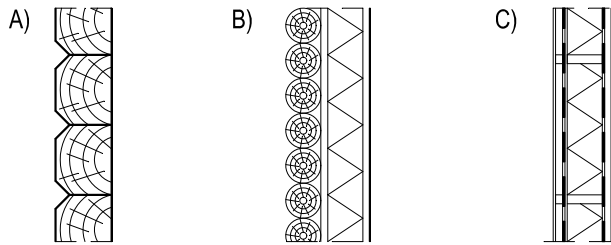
Examples of wooden wall constructions (Source: own elaboration)
